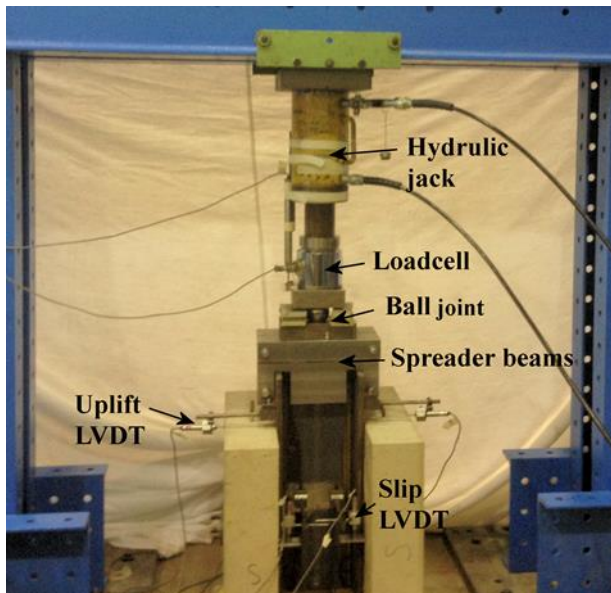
Details of testing rig and specimen for LNSC pushout Tests 2
